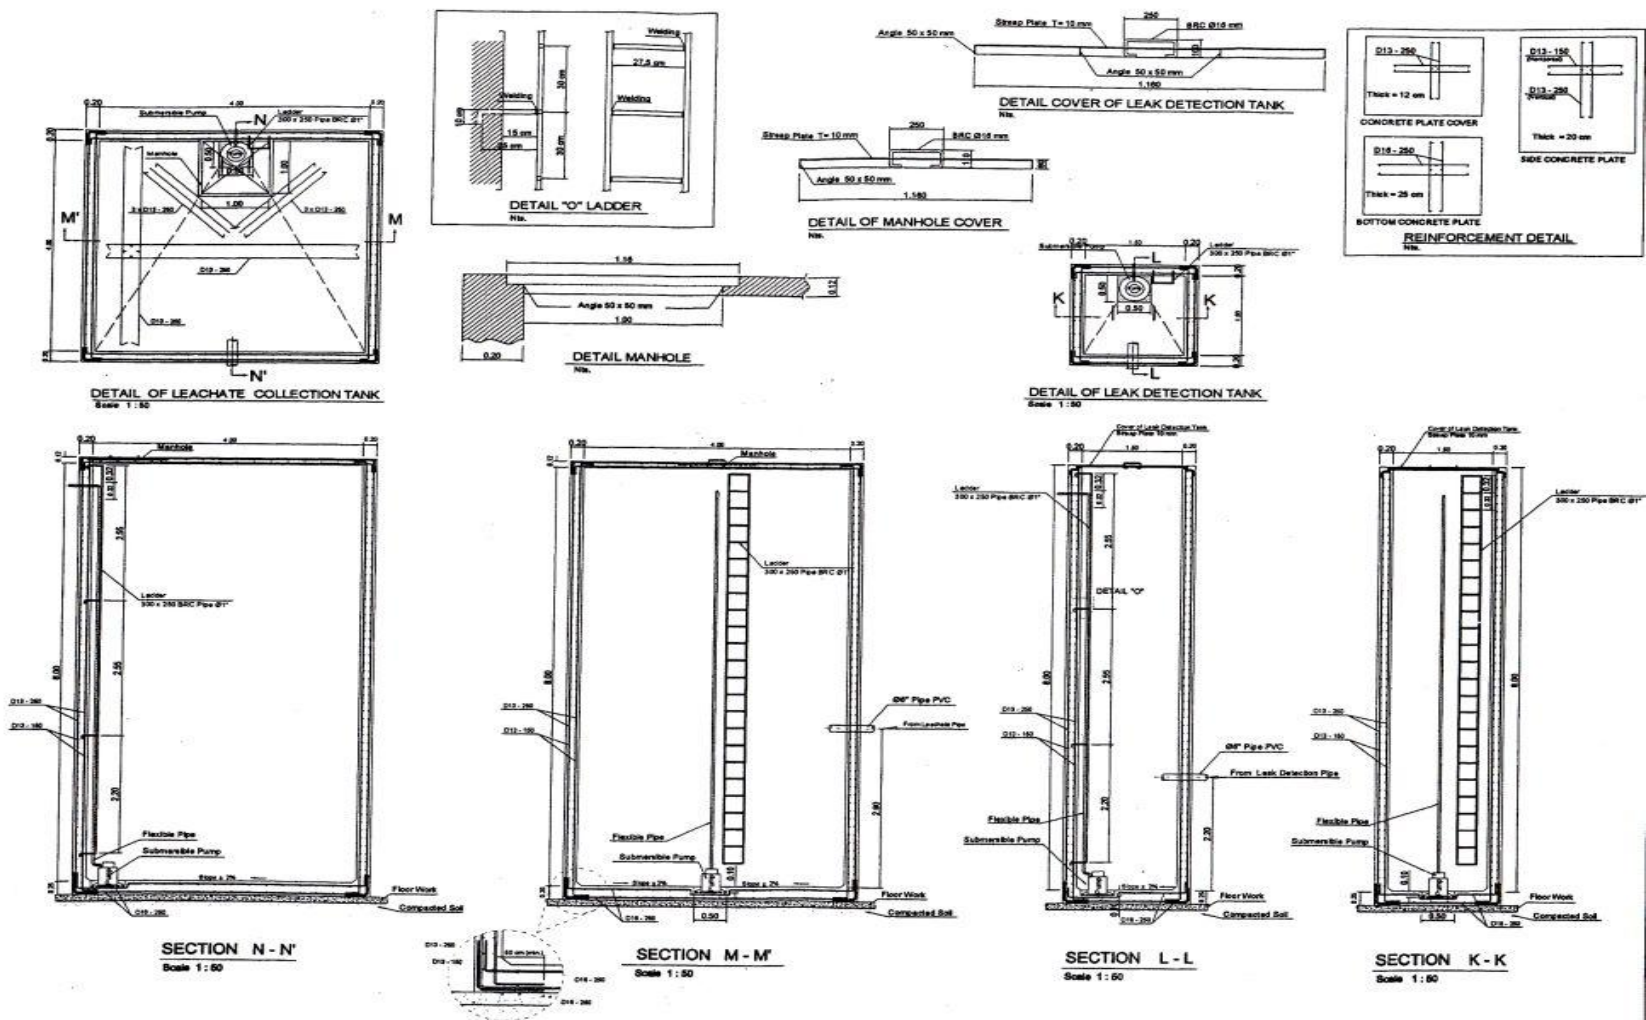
Detail of Leachate Collection and Leak Detection Tank
